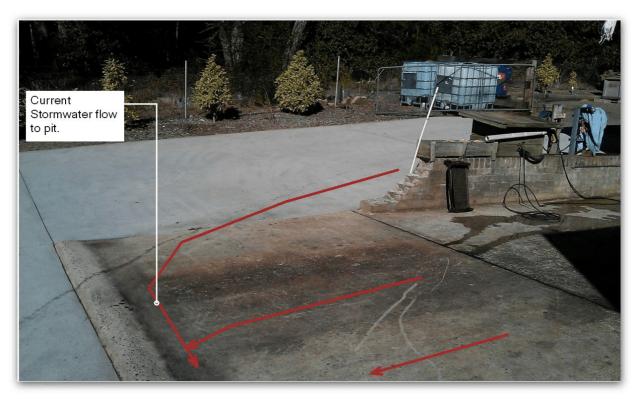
The missing wall allows stormwater to enter the wash-down bay and into the sump.
